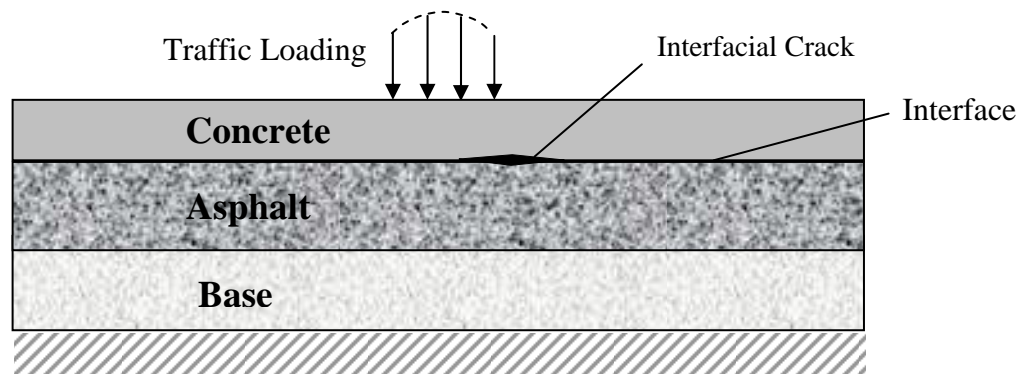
Concrete Overlay on Top of Typical Asphalt Pavement
